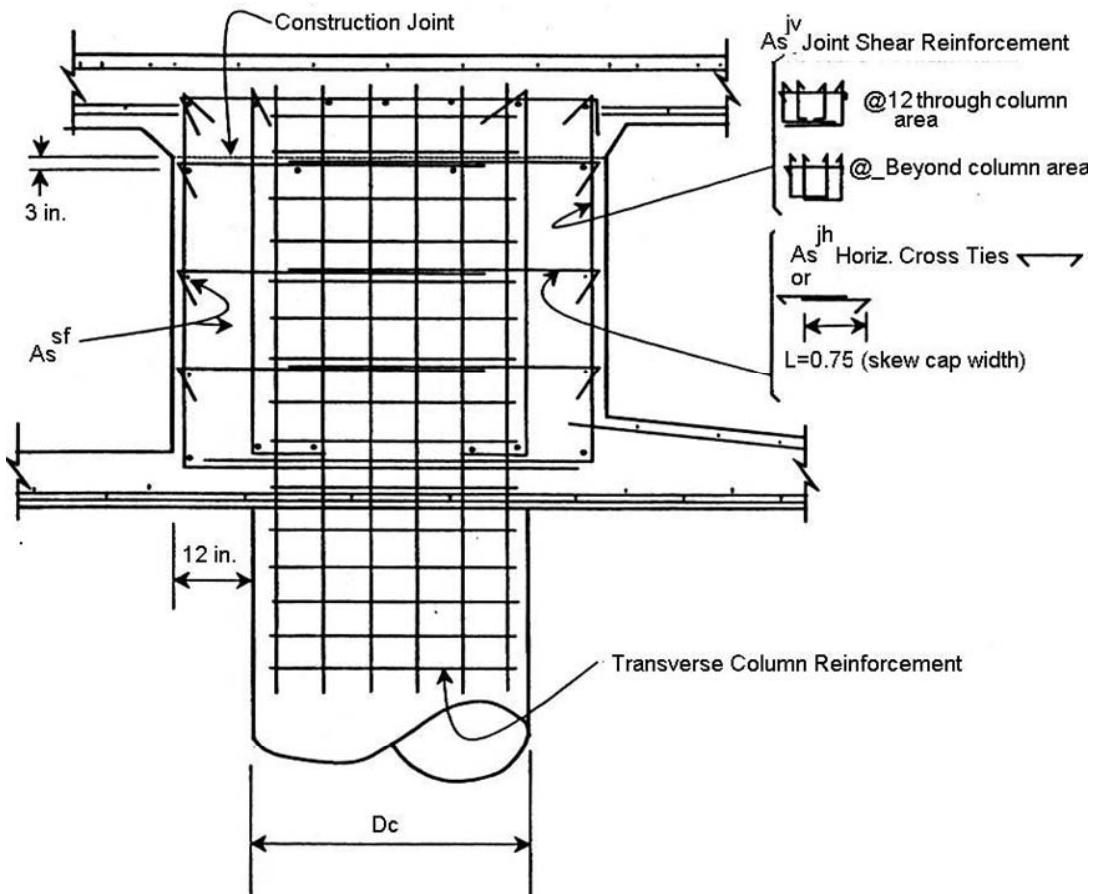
Joint Shear Reinforcement Details
